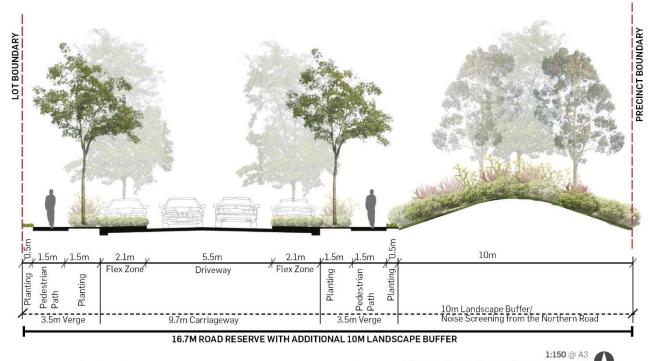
Residential Local Road along the Northern Road (16.7m + 10m)
